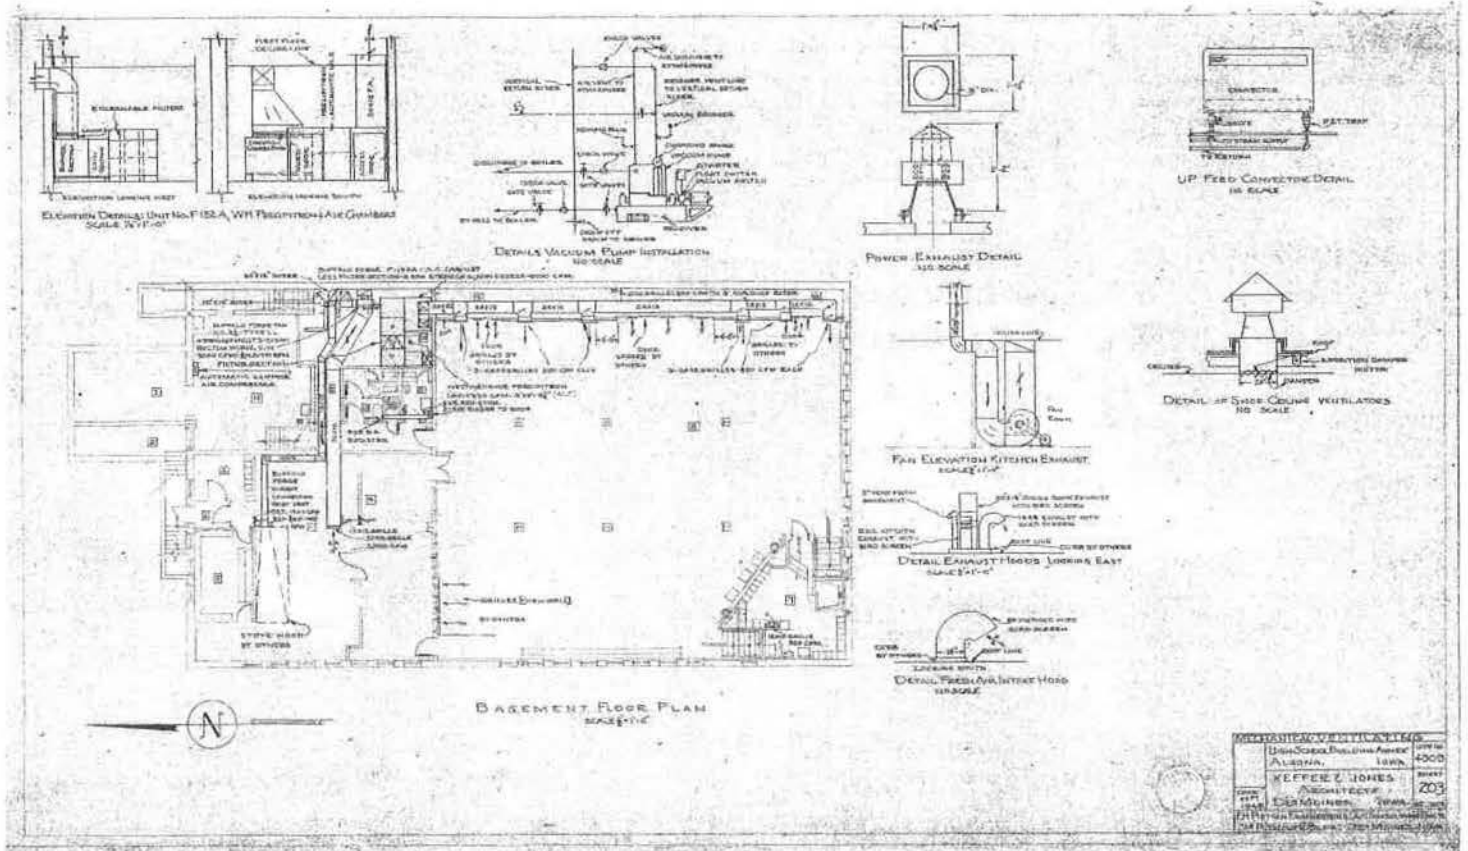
School Annex, Basement Floor Plan (Drawn by Keffer and Jones Architects, 1949)
